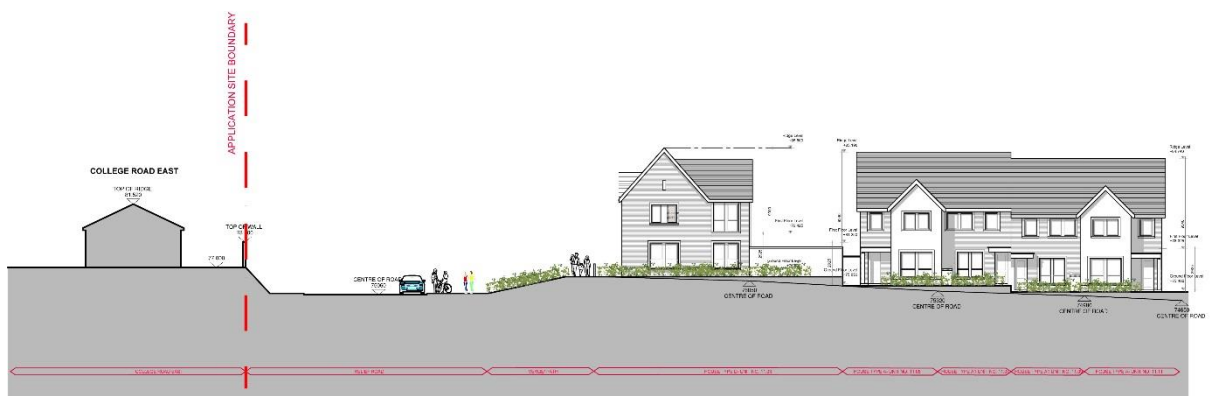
Cross Section through link road at Street 11. House on College Road East to the left. Note that the frontage along the eastern section of the link Road consists of rear boundary walls.
